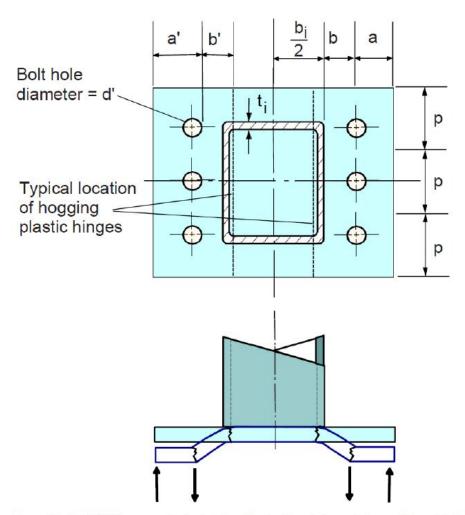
RHS flange plate joint with bolts at two sides of the RHS
